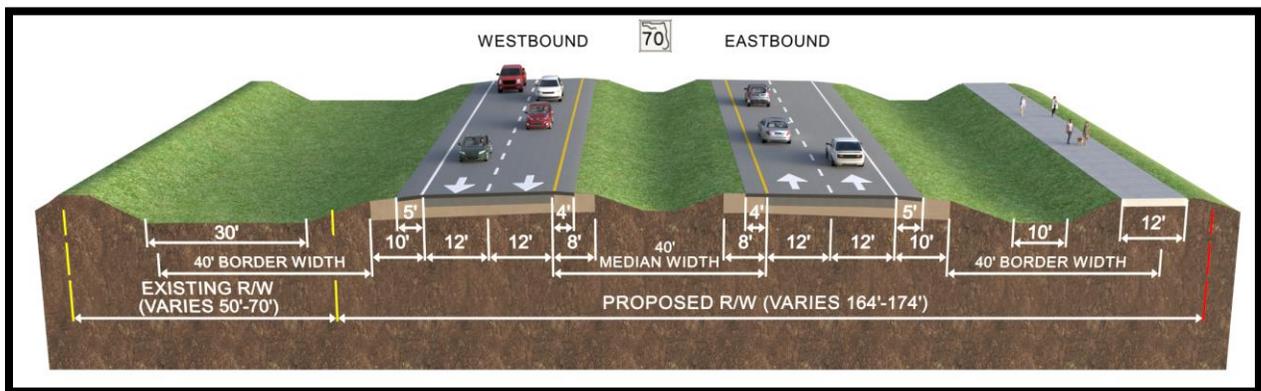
| SR 70 – Proposed Roadway Typical Section One
